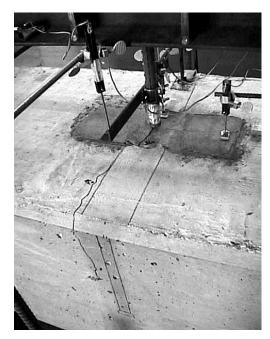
Extension of Splitting Crack into Surrounding Concrete (SL03)
